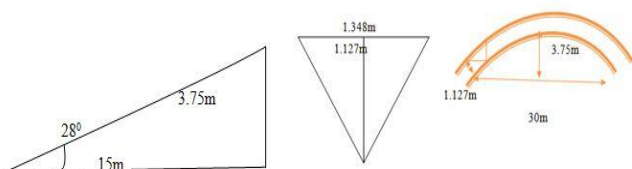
Truss configurations showing cross section and elevation of Truss
